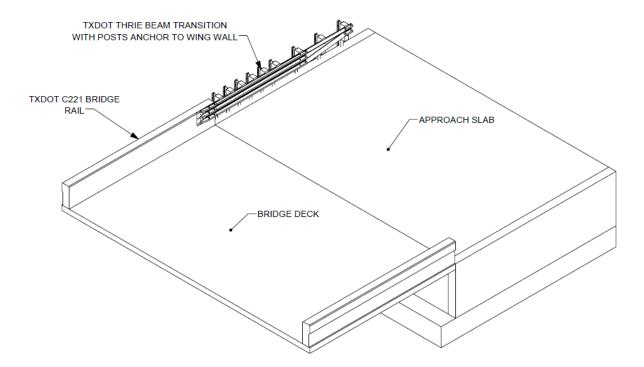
TxDOT Transition Anchored on Top of 12-Inch Wide Wing Wall.
